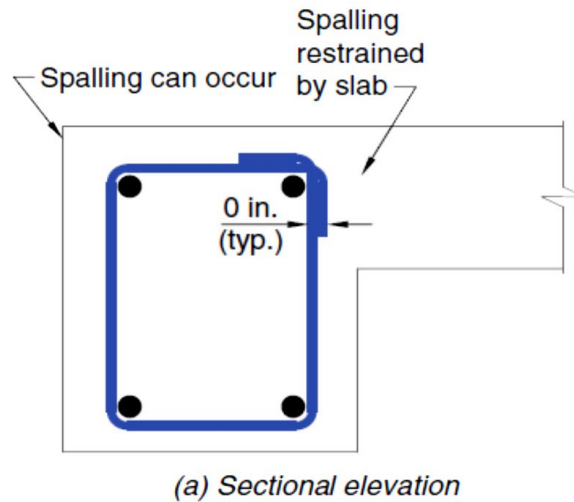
Spalling of corners of beams subjected to torsion.
